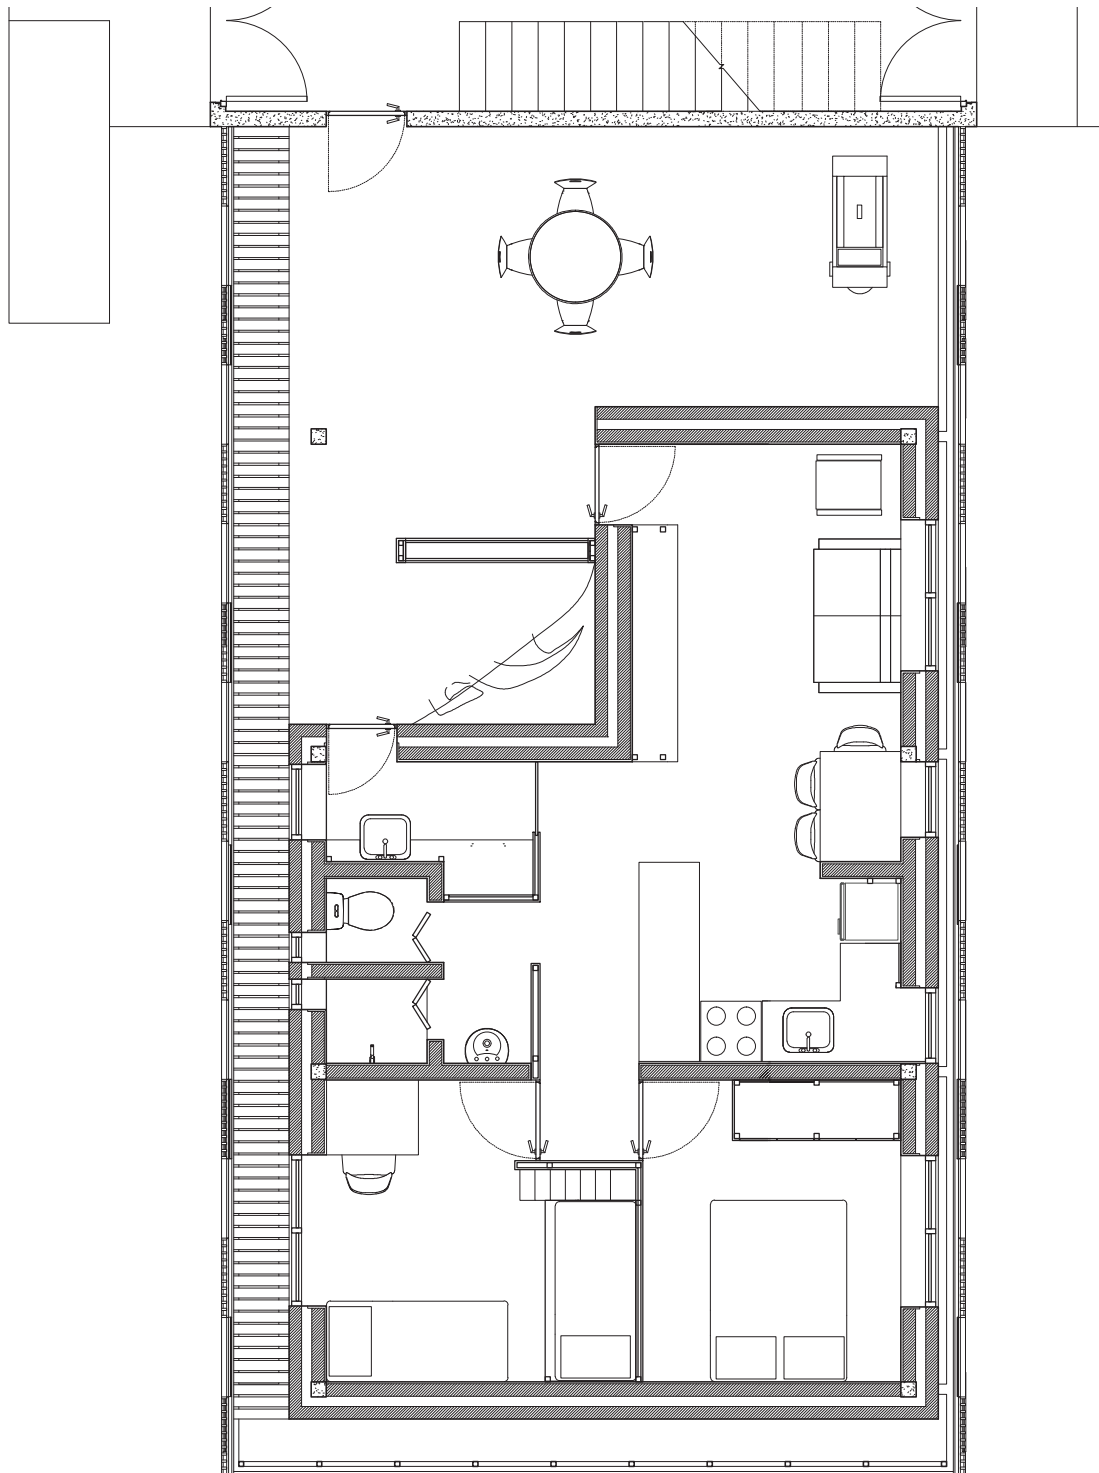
Plan of the apartment W, scale 1:75.
